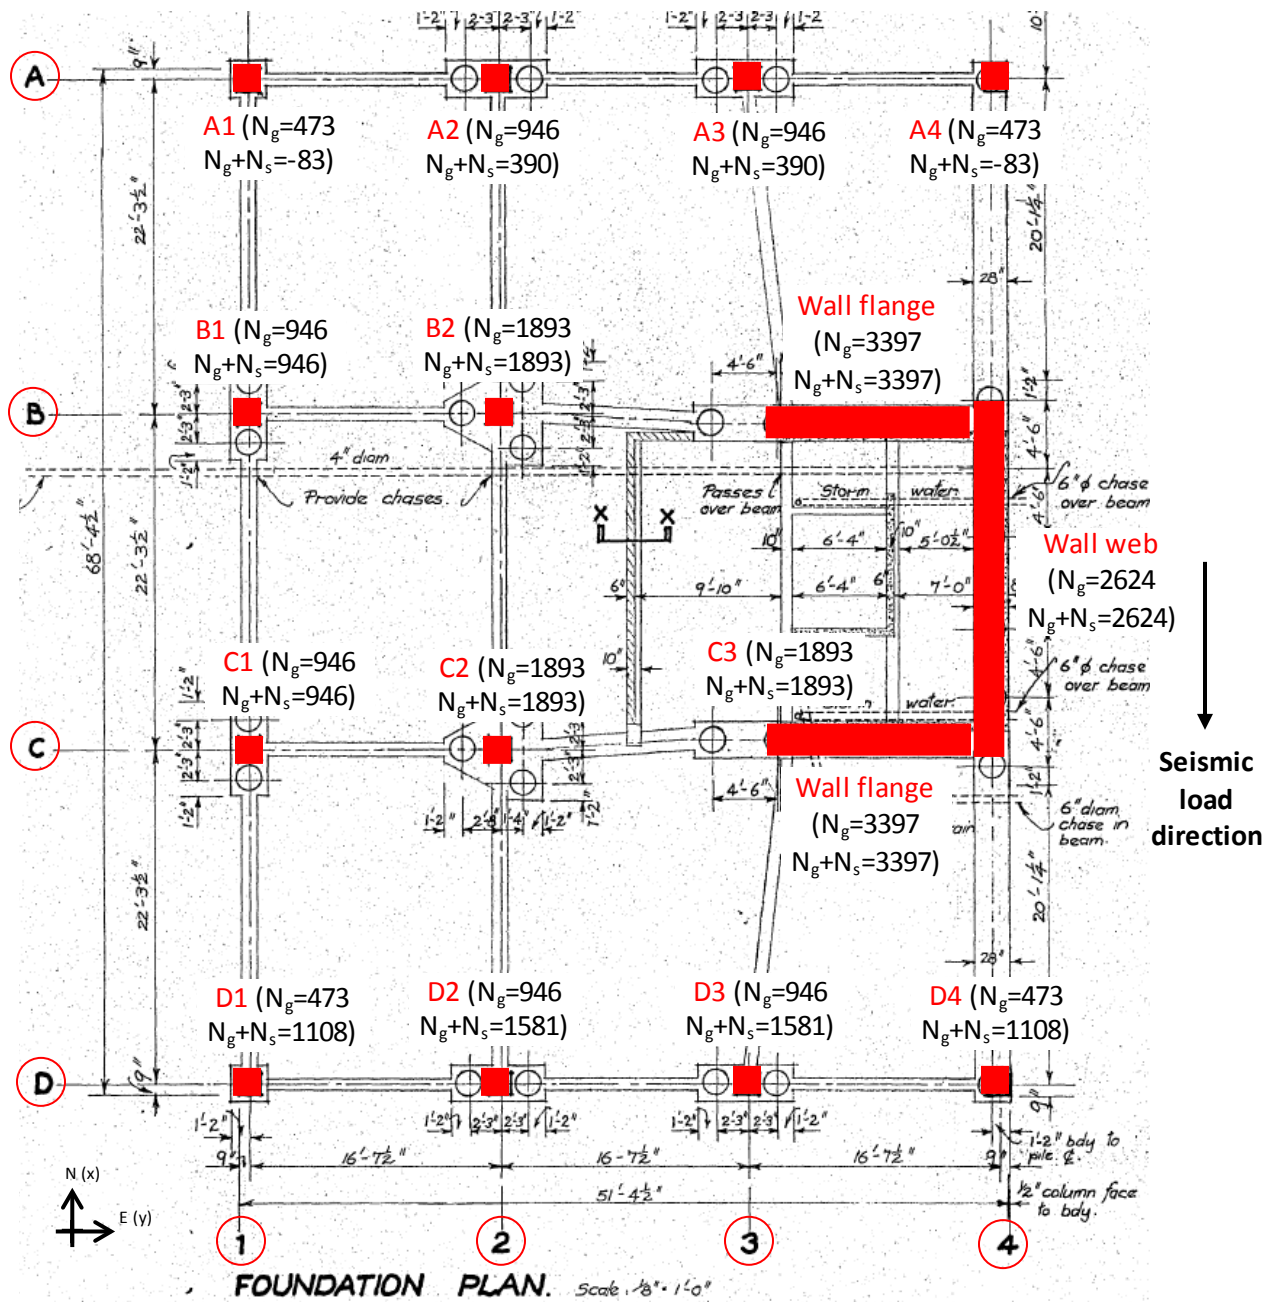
Foundation plan and acting loads in kN (earthquake Y direction N-S).
